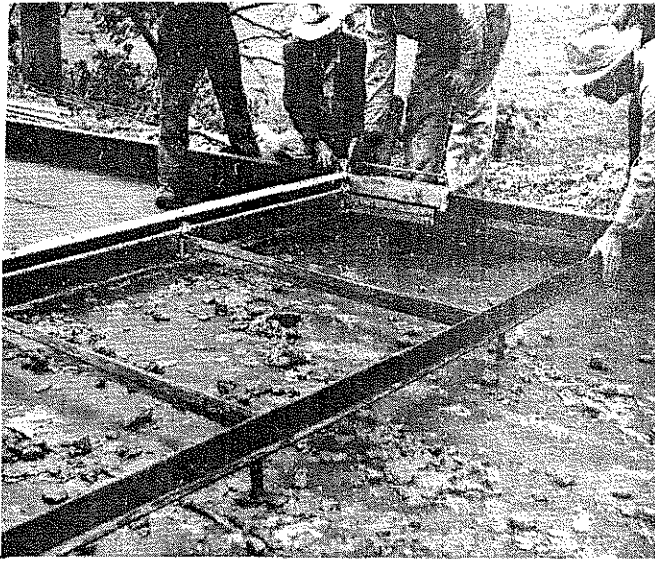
A view of the aluminum load transfer device, with the removable cap in place, secured in position by the tong apparatus. The circular bar, with the spring and eccentric attachment, which operates the tongs, may be seen in the upper portion of the photo.
